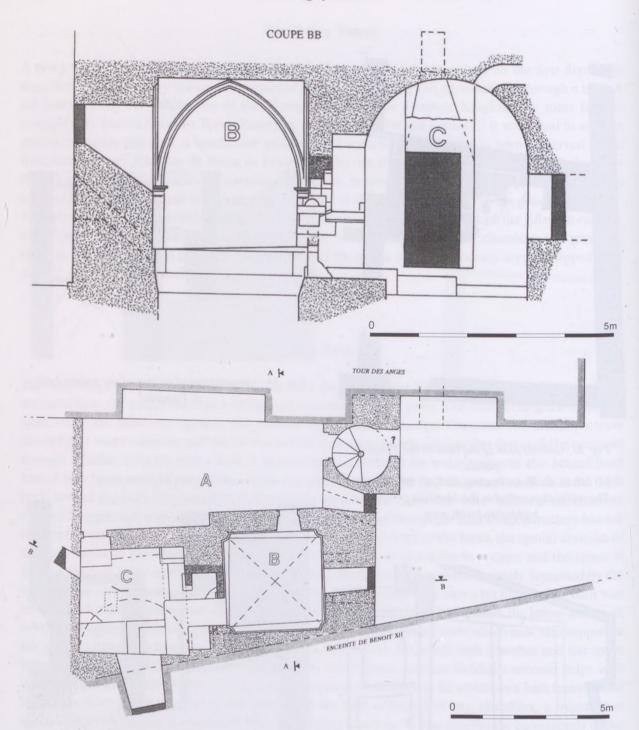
a-b. Avignon, the section and ground plan of the bath in the papal palace
